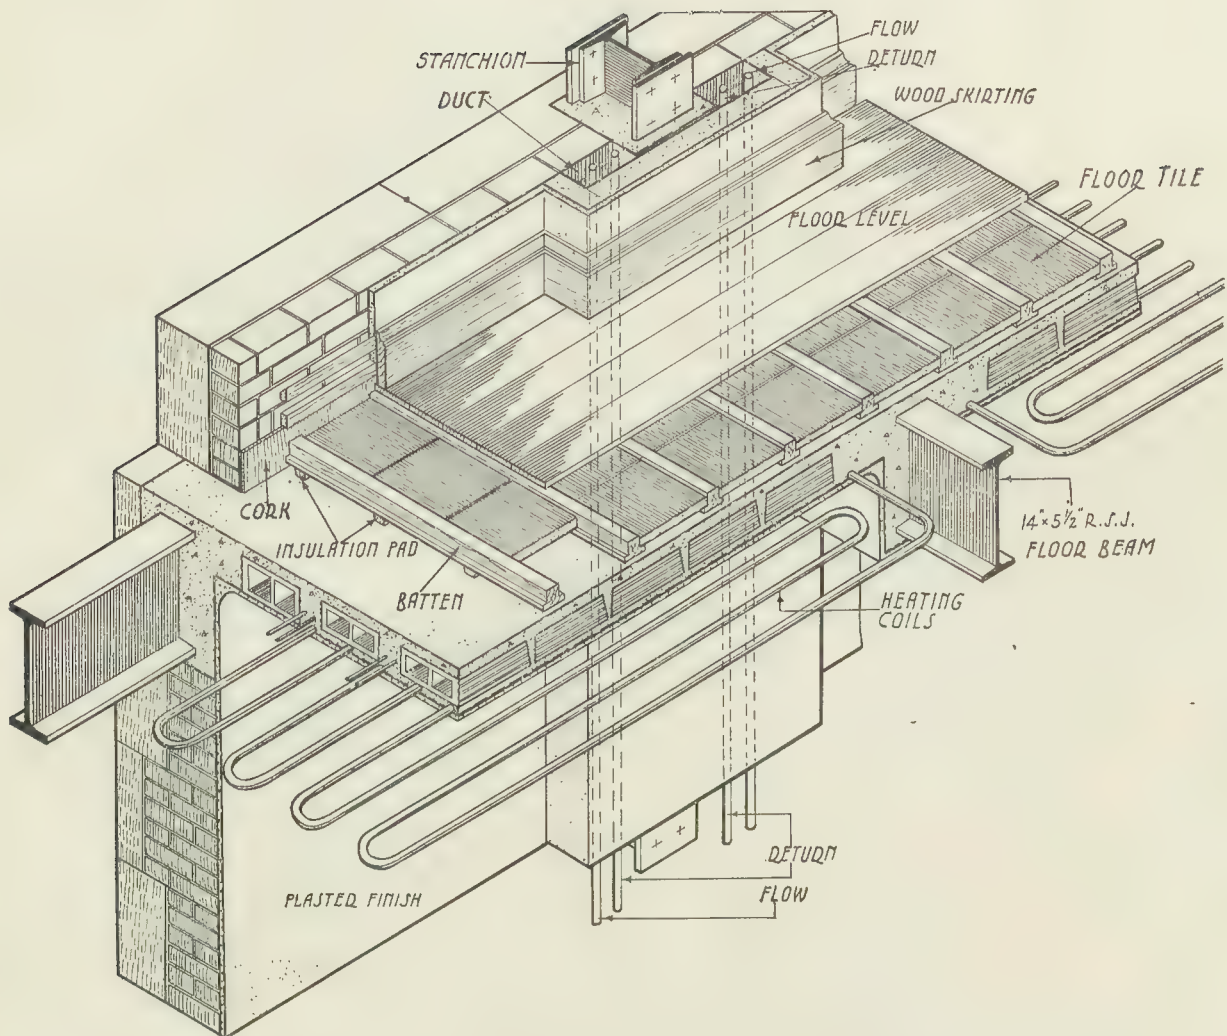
SOUND-PROOFING HOLLOW BLOCK FLOORS AND PANEL HEATING PIPES EMBEDDED IN FLOOR SLAB
